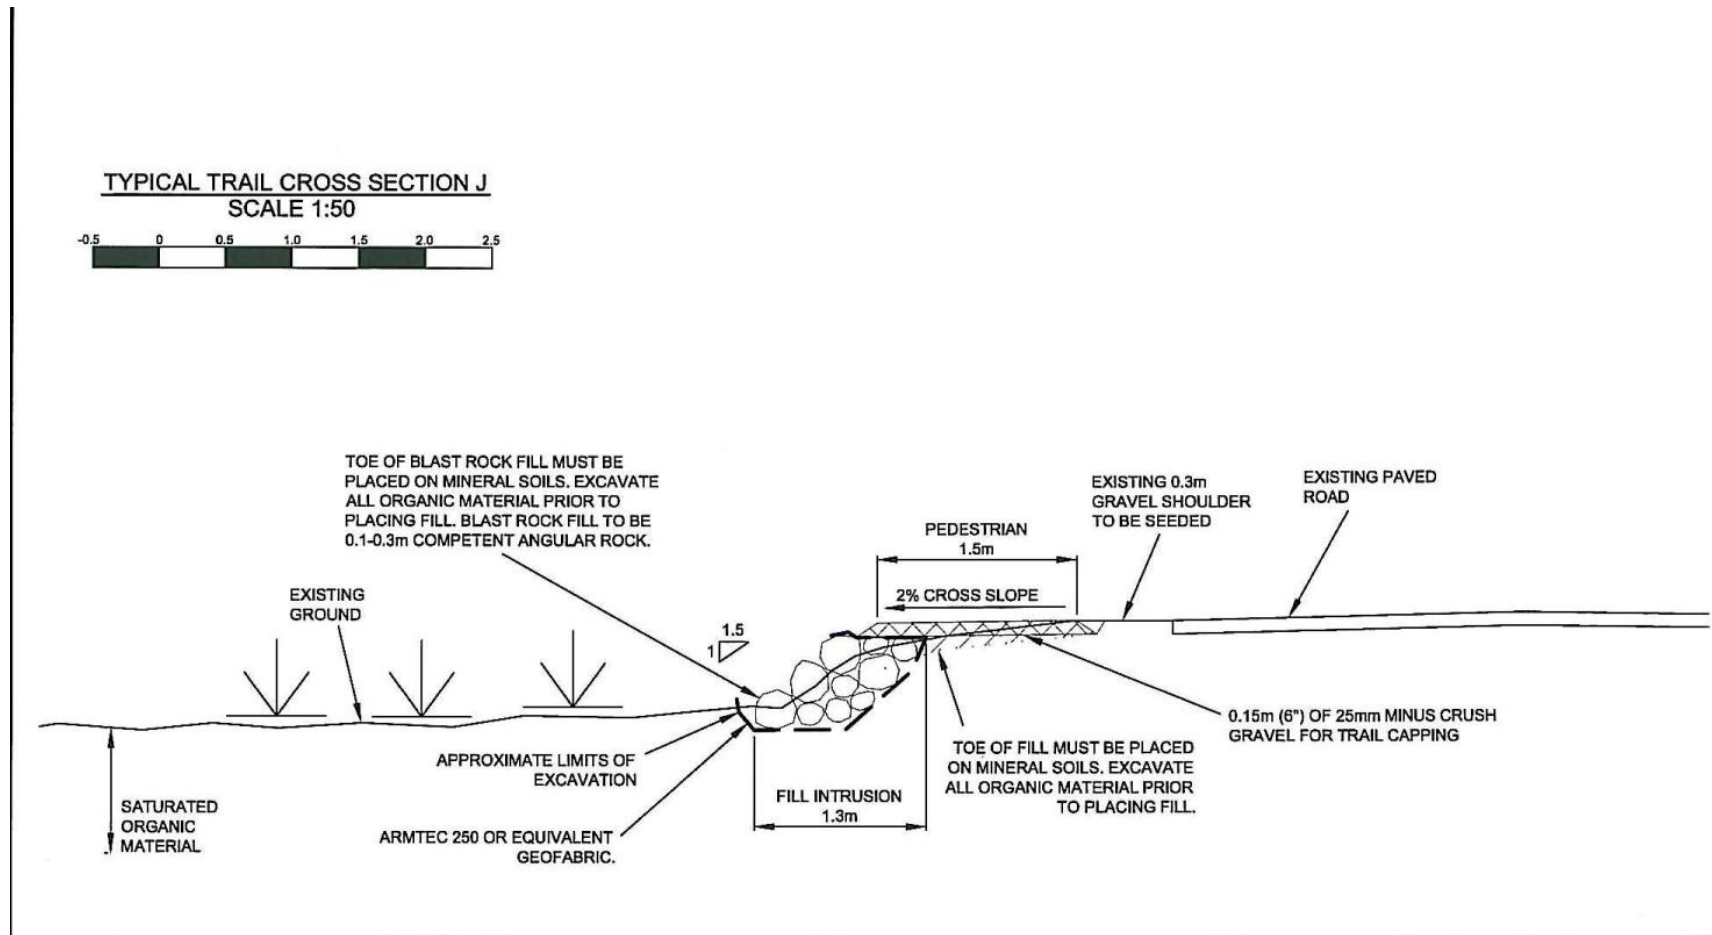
Typical cross section of project design components for the pedestrian trail at the Graveyard Marsh project footprint. Adapted from Onsite Engineering Ltd.
